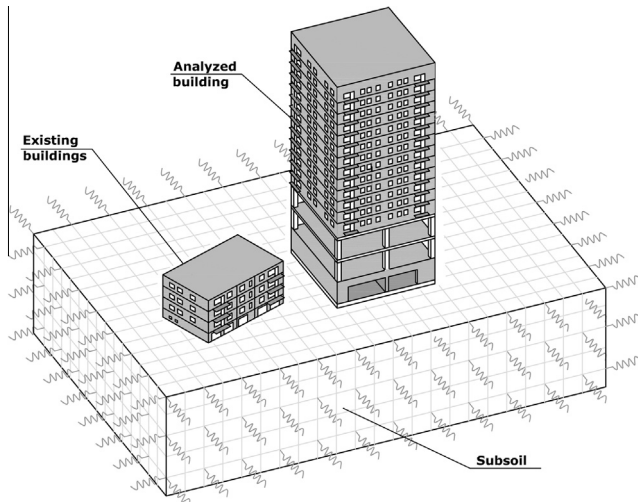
Spatial FEM model: new building/with deep foundation - subsoil - neighbouring buildings.
